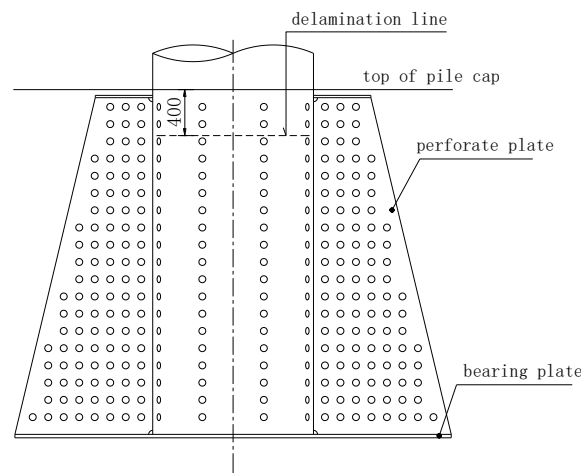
Pier bottom bearing plates + PBL shear keys (Unit: mm)
